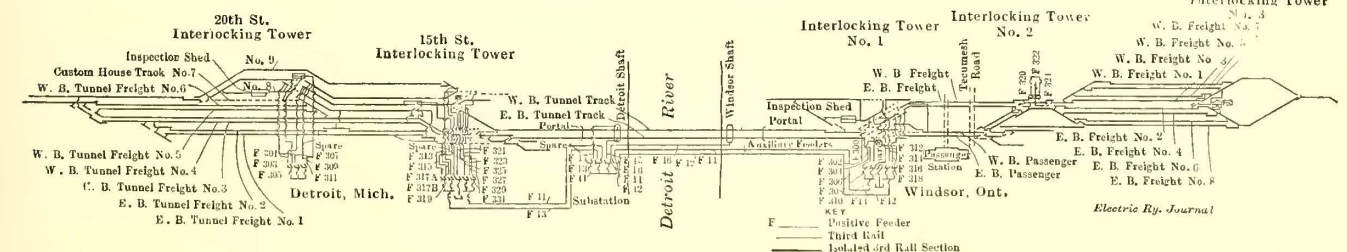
Detroit Tunnel—Layout of Third-Rail Feed and Jumper Connections
